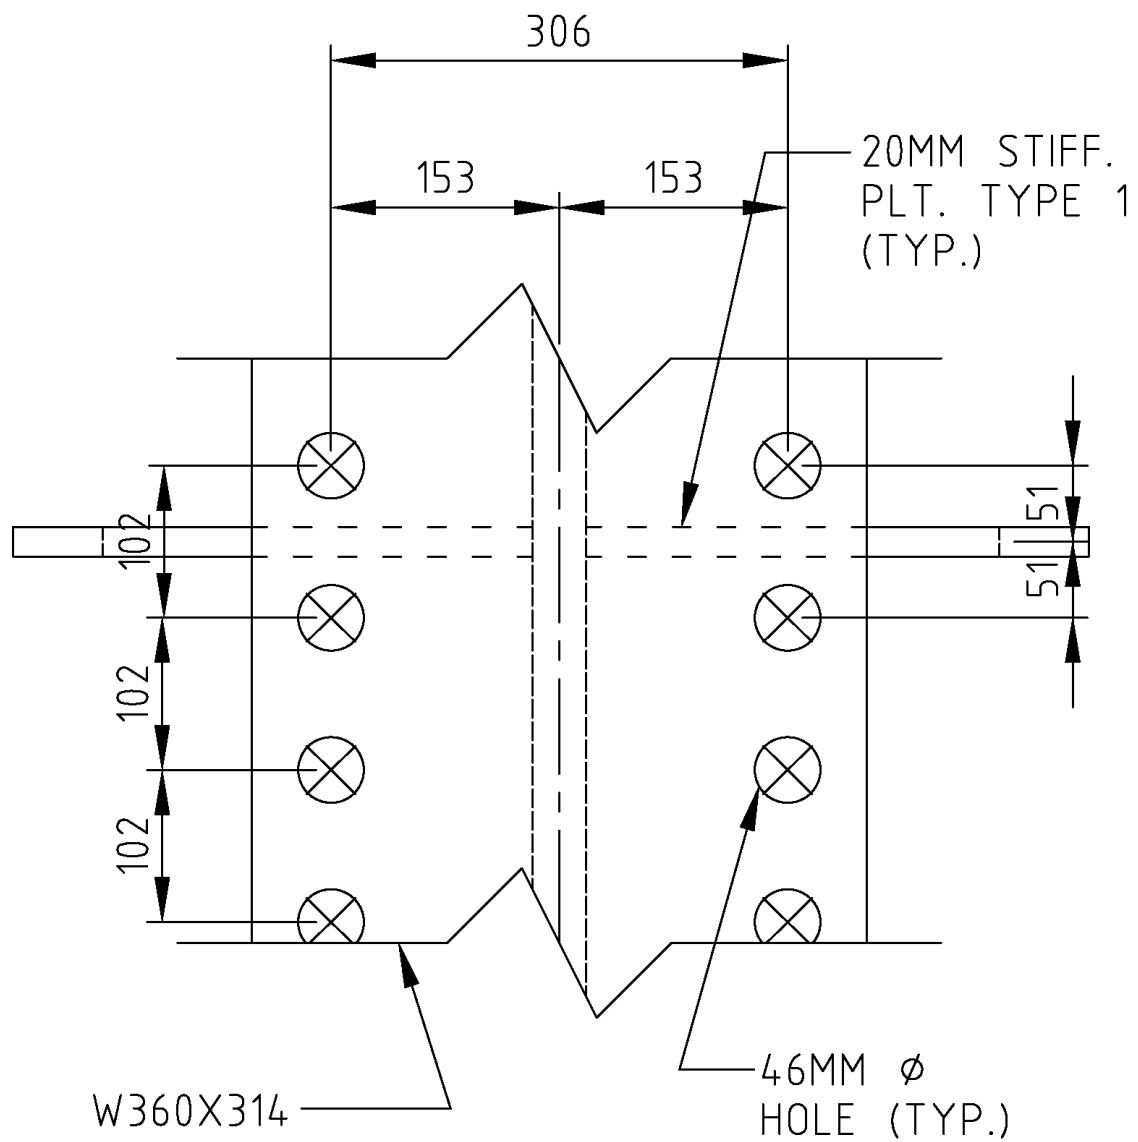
Wall mount loading system design and fabrication drawing – Drawing 12.
